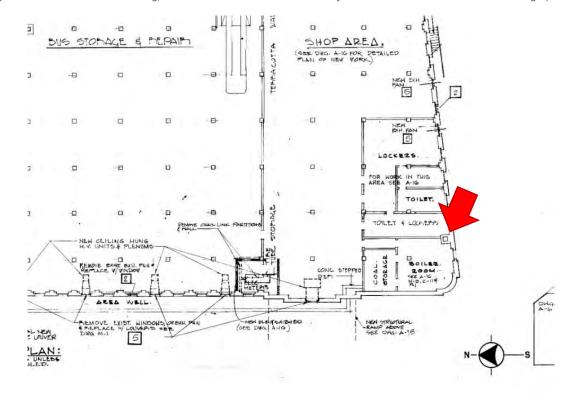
1978 Renovation drawing; red arrow shows the smokestack adjacent to the boiler room and coal storage (WMATA)
